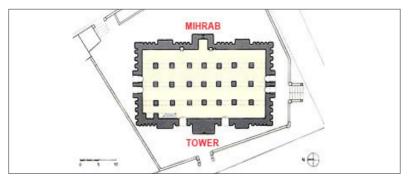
Great Mosque of Mopti, plan showing the main tower and *mihrab* and *qibla* wall
